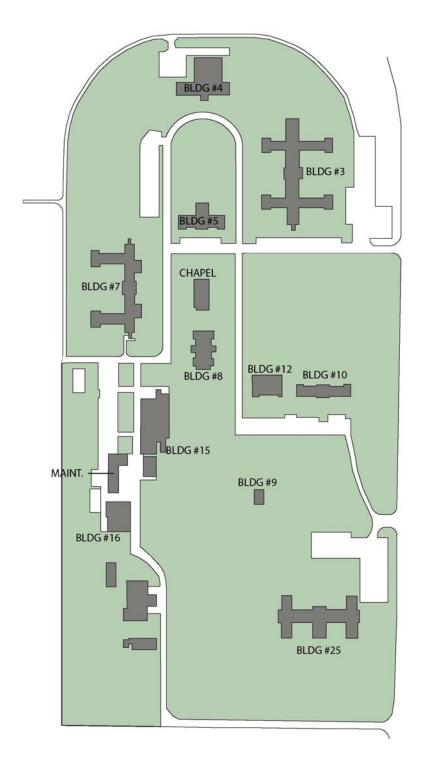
, EXISTING HRC CAMPUS PLAN
